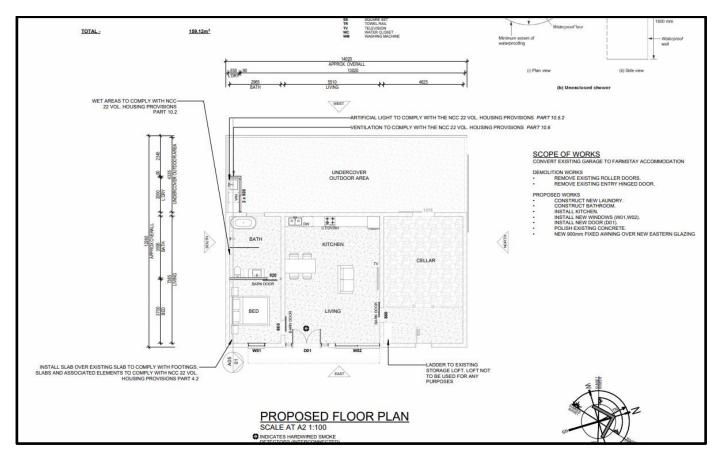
Proposed Floor Plan Farm Stay Building – Lot 4(Source: Reward Character Designs)
